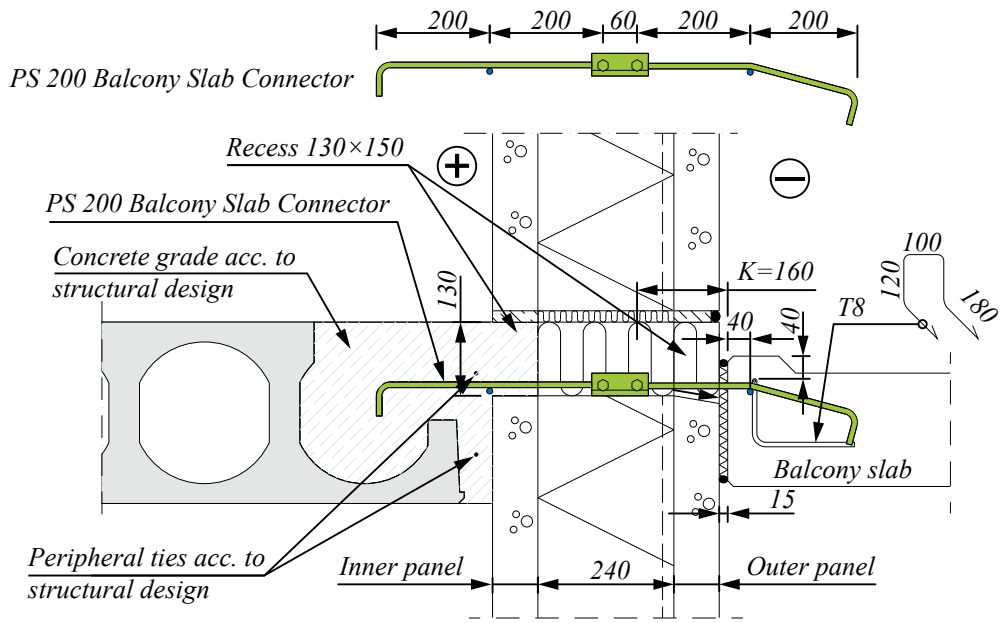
Balcony Slab Connector PS 200 in a non-load-bearing wall.
